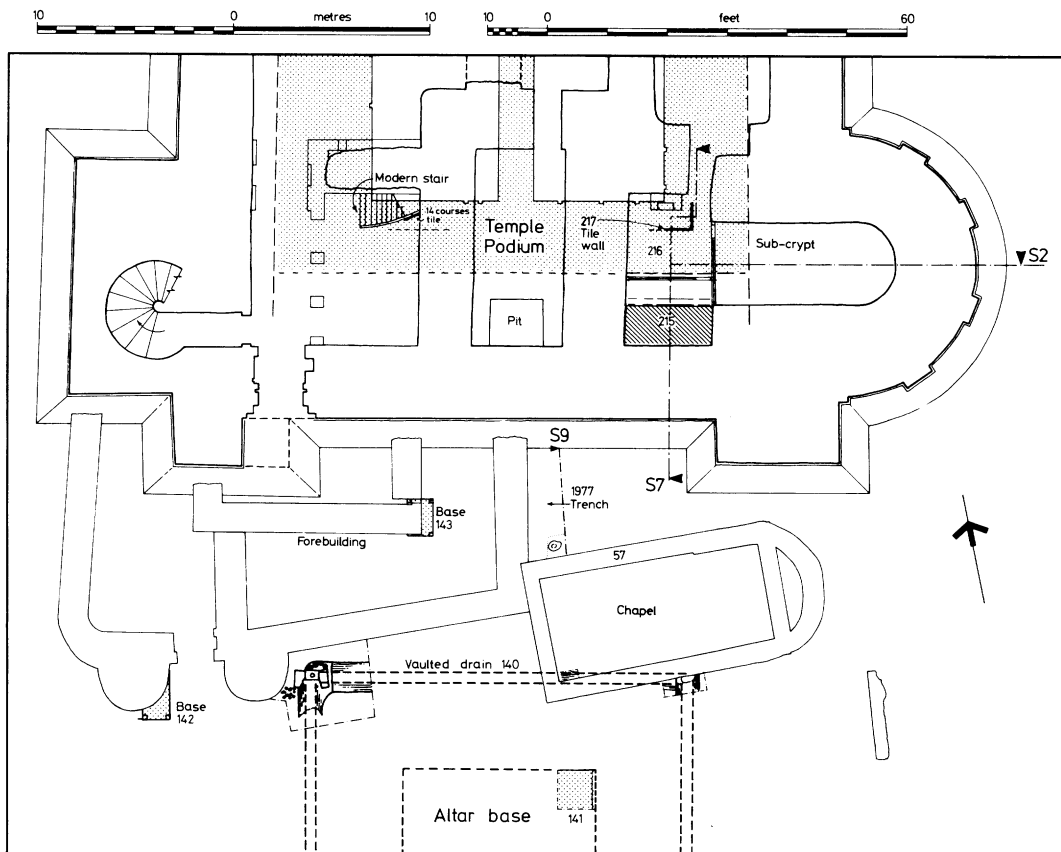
Plan of the Roman features found in the excavations undertaken in and south of Colchester Castle keep in 1931-3 and 1977.
